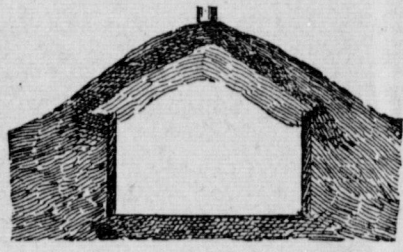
CROSS-SECTION OF POTATO PIT.
